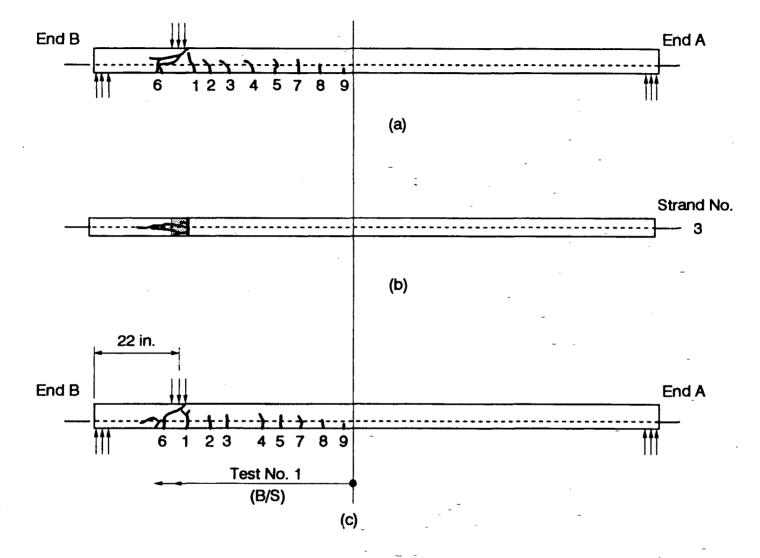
Crack pattern for D-type Specimen No. 17-6.0DC-3:
